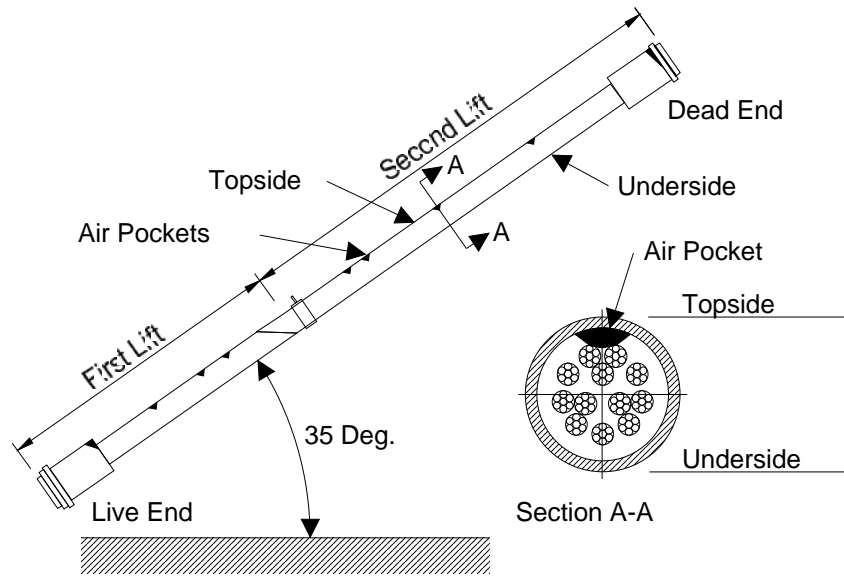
Orientation of Stay Specimen for Grouting and Air Pocket Locations.
